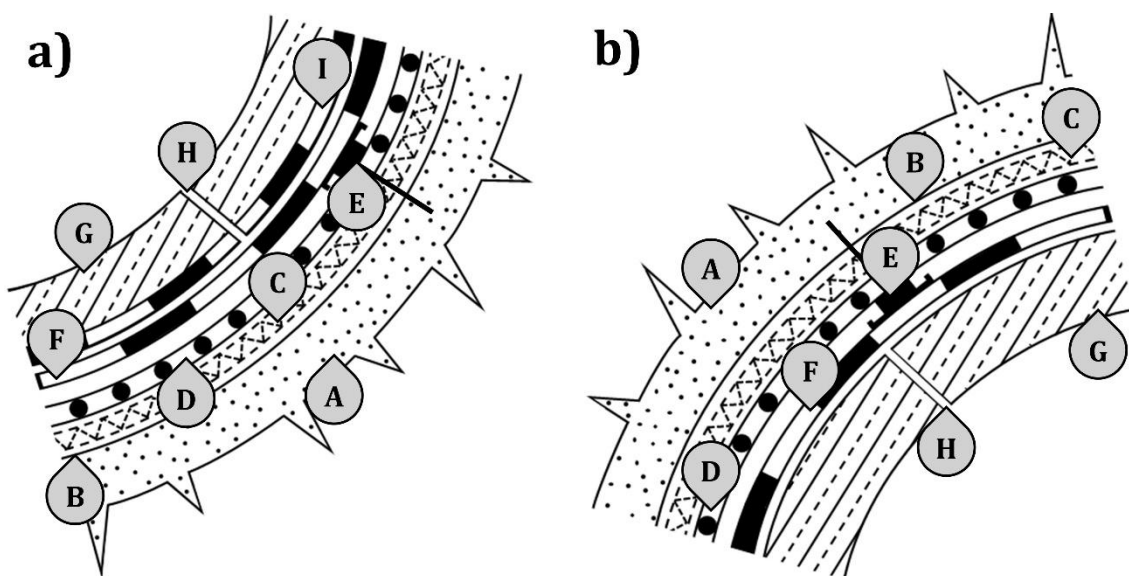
Structure of a tunnel construction with SWM waterproofing in the invert (a) and in the tunnel arch (b), based on (9) and (2): A – sprayed concrete outer lining; B – waterproofing substrate; C – drainage elements, if required; D – protective layer on the rock side; E – fixing elements; F – plastic waterproofing membrane; G – concrete inner lining; H – grouting pipe; I – protective layer on the tunnel side; based on (9)
